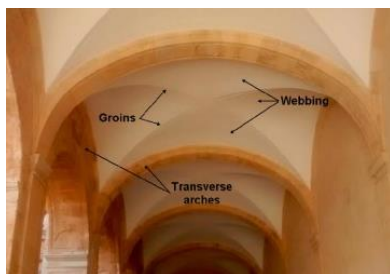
Groin vault built on transverse arches (Bertolesi et al., 2019).
